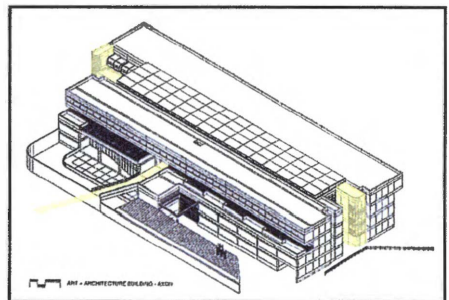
A&A Building Pulled Out Circulation Elements and the Bridge
